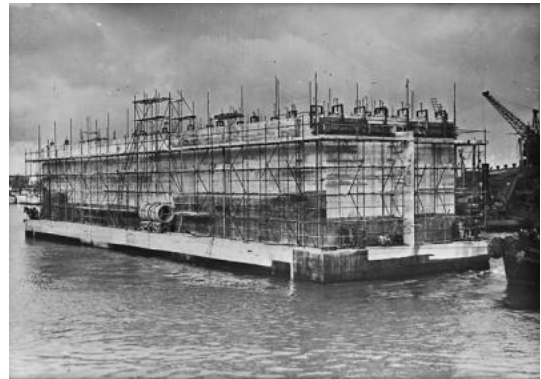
Phoenix Caisson, WW II Atlantic Ocean floating, concrete pier under construction
